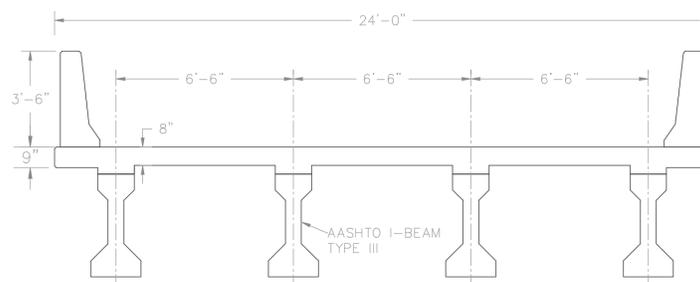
Section with 24 ft. width (over the gated structure)
